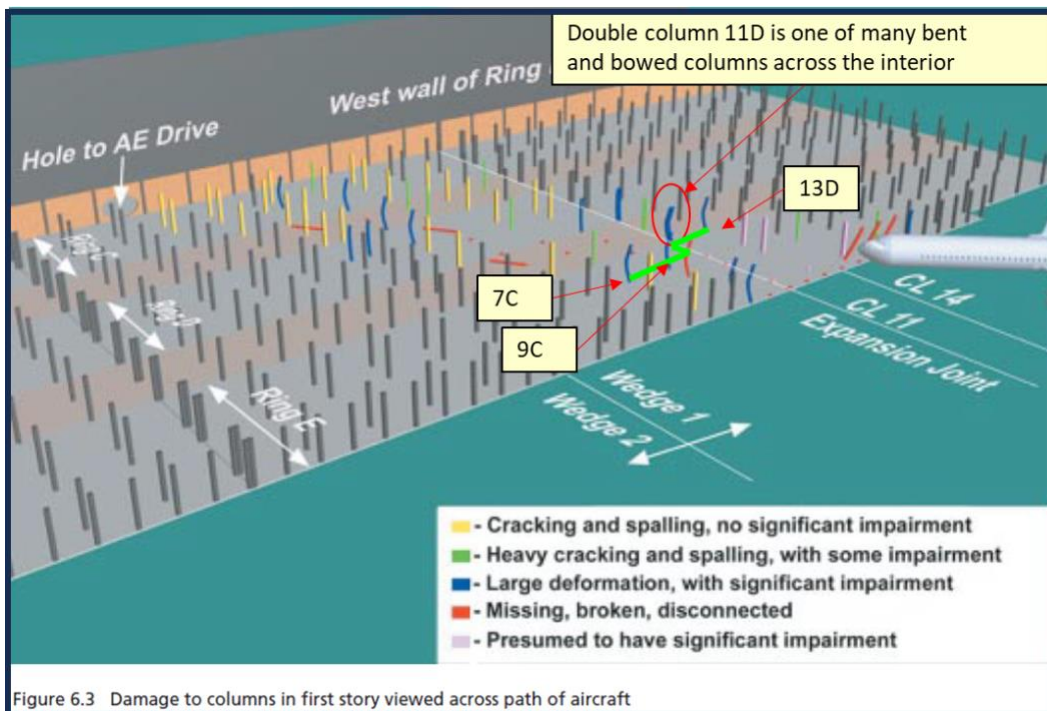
Damaged first floor columns, documented to have been bent-and-bowed, are shown in blue.
